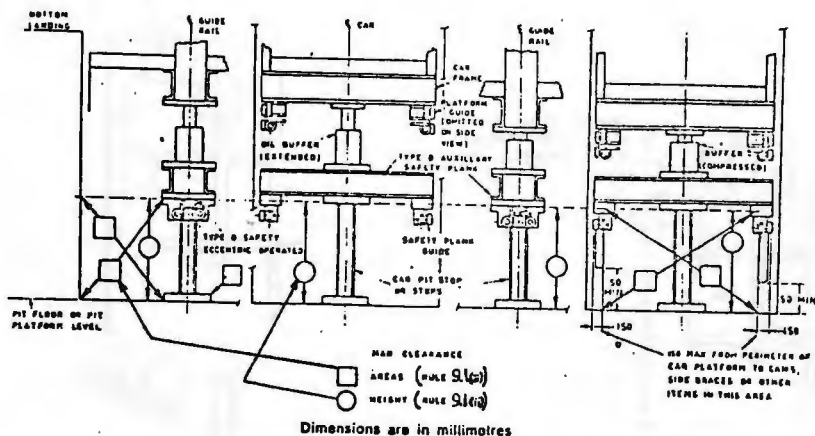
BOTTOM CAR CLEARANCES—TYPE D SAFETY GEAR
